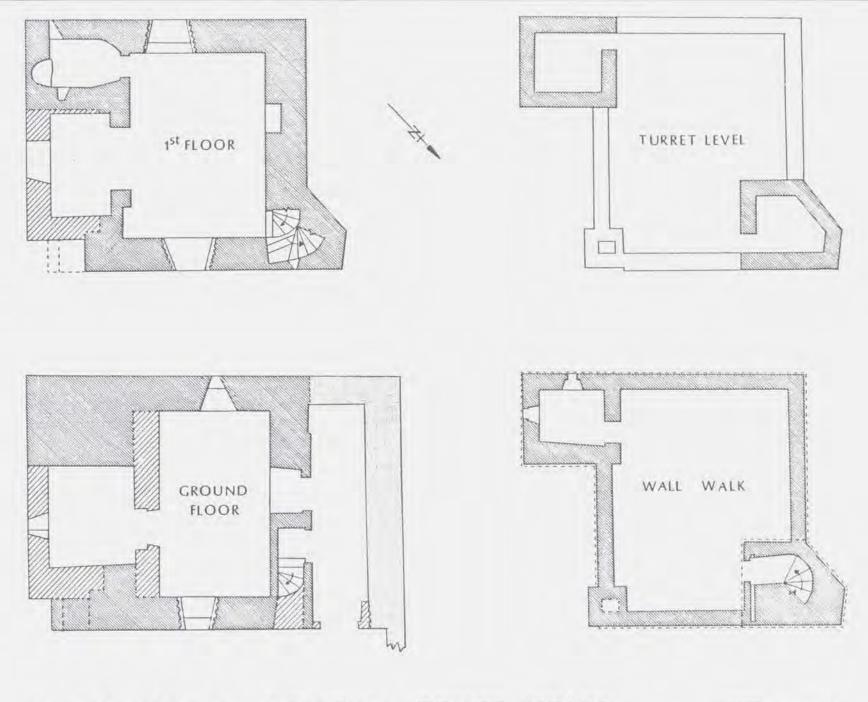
Louth: St. Mochta's House, plans and elevations (after Leask)
